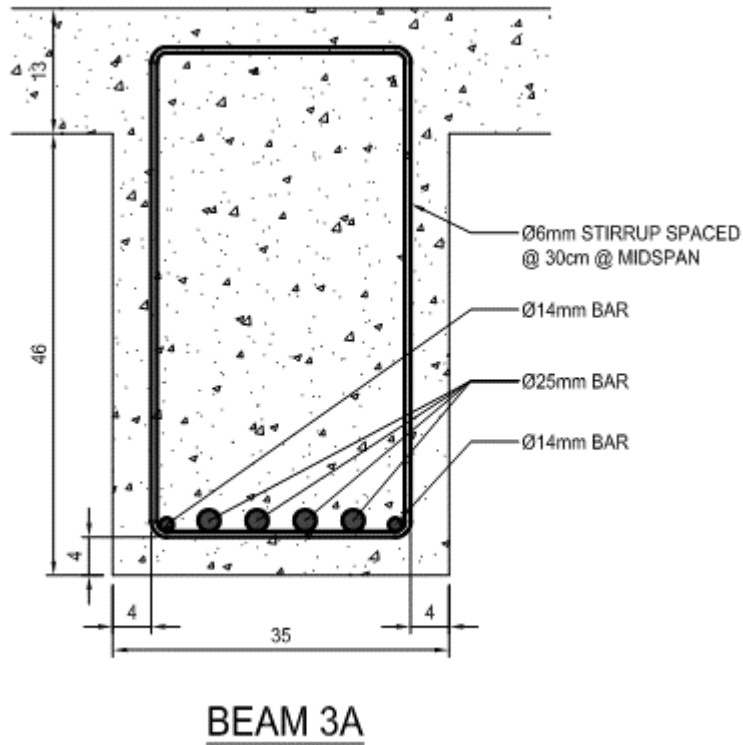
Beam 3A Cross Section with dimensions in centimeters [16]
